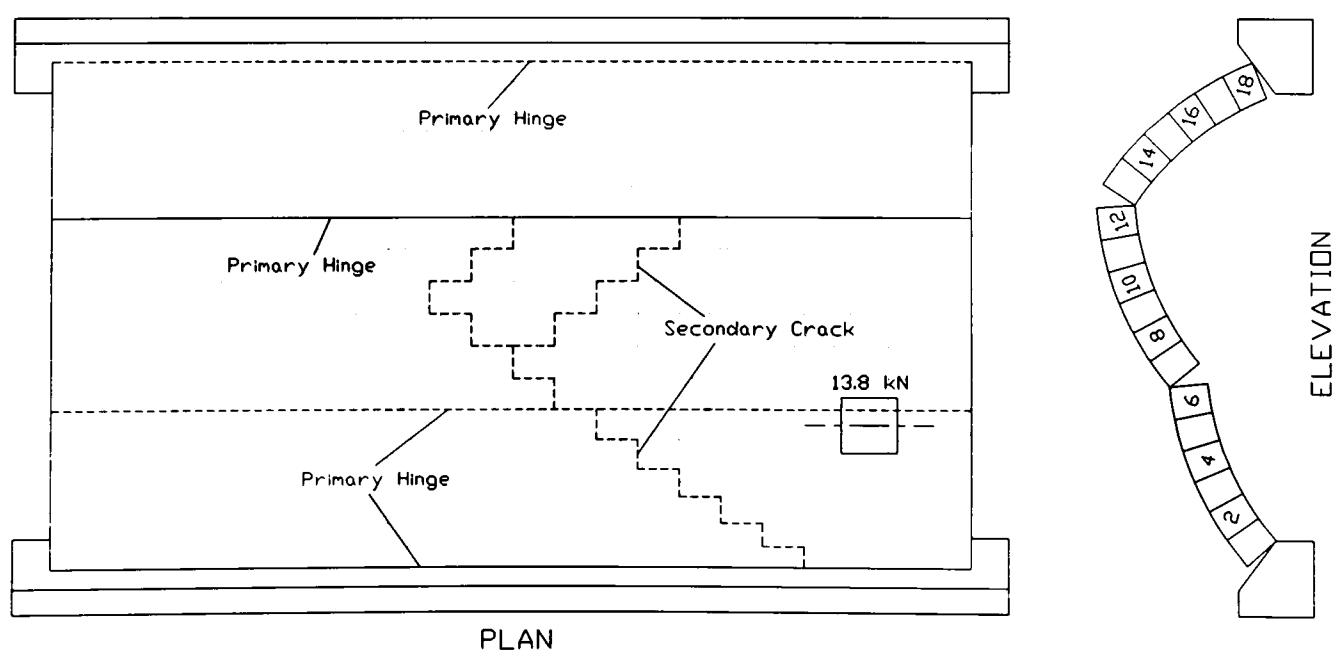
Crack pattern and failure mechanism of arch 1-3
